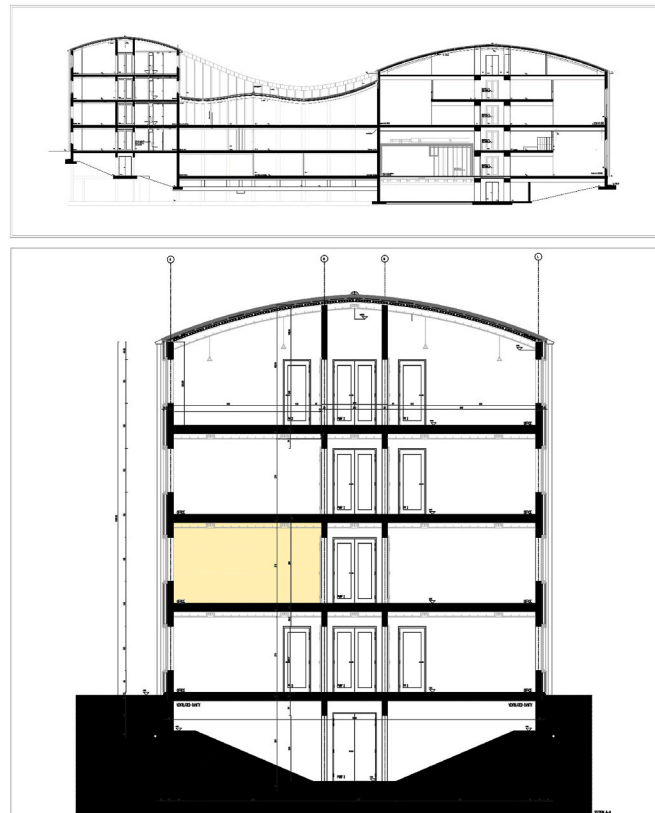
Longitudinal and transversal sections of the building B52 of the University of Liege. In yellow the studied office.
